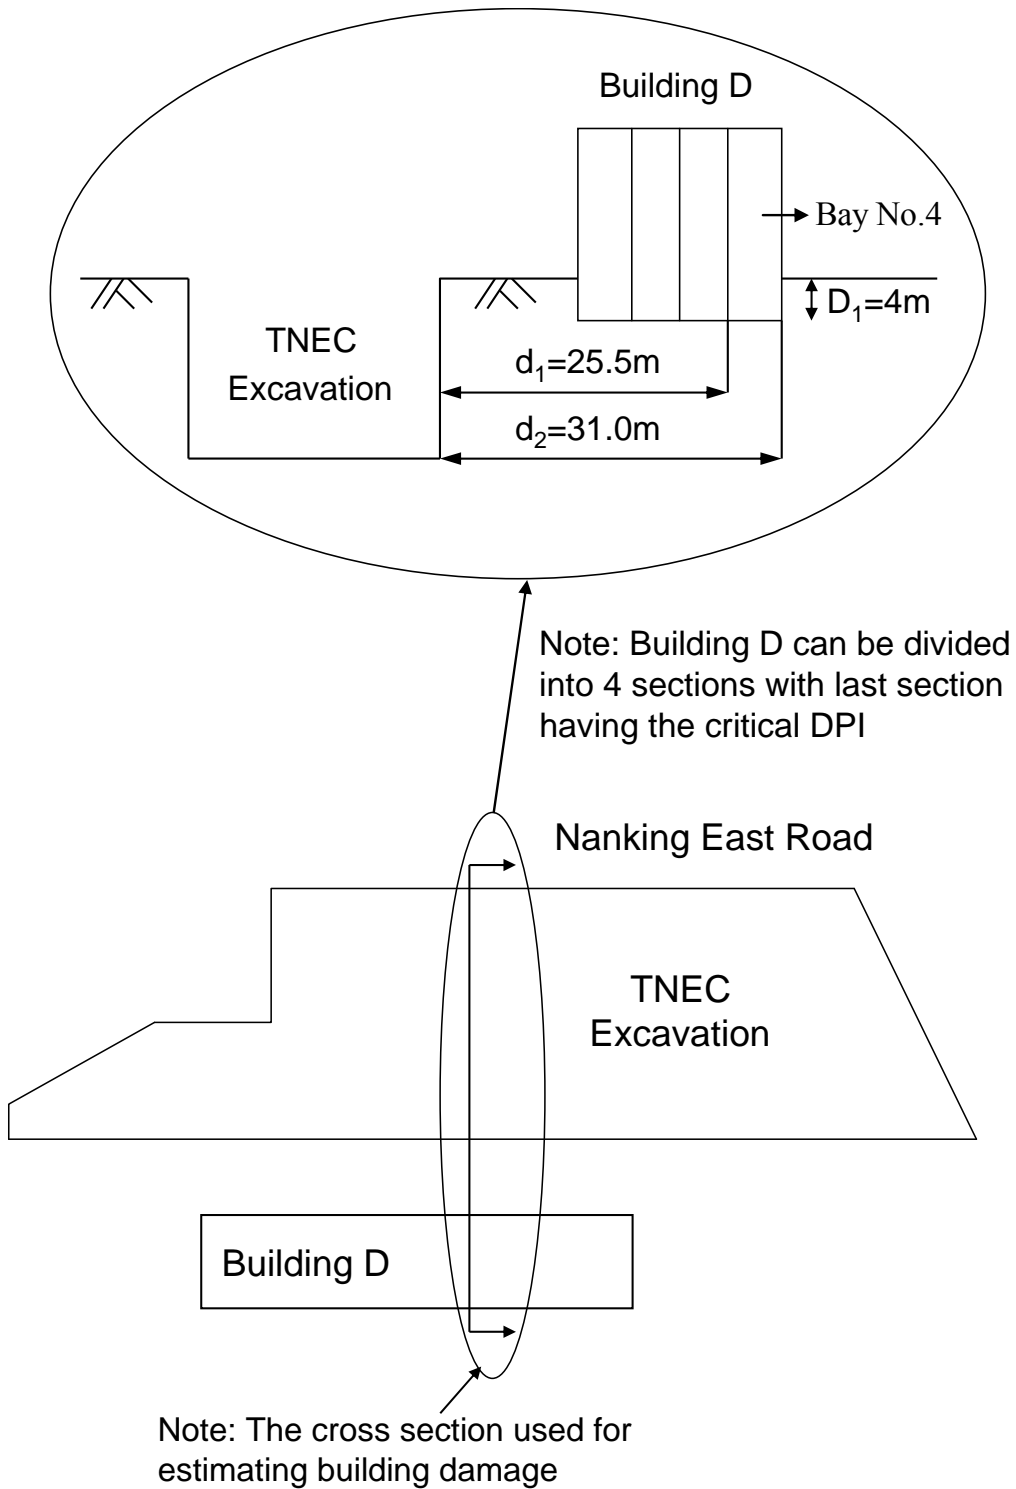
Location of excavation and Building D in the TNEC case (adapted from Juang et al. 2011)
